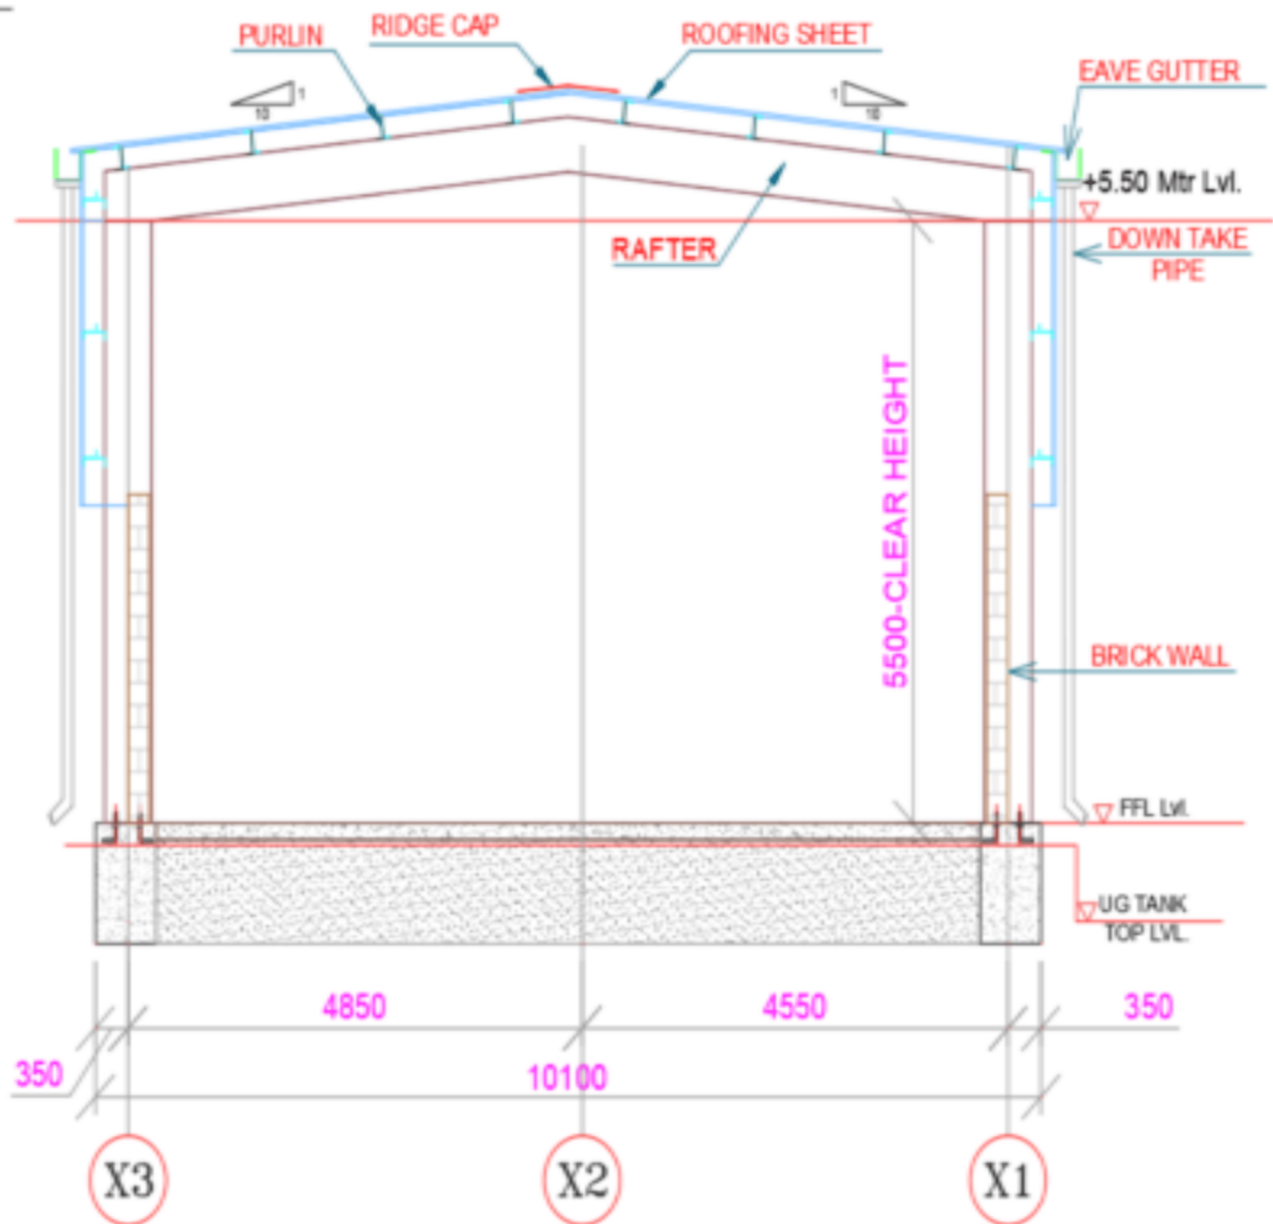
Transverse elevation of the industrial warehouse roof slope (1:10), column arrangement, and principal geometric dimensions
